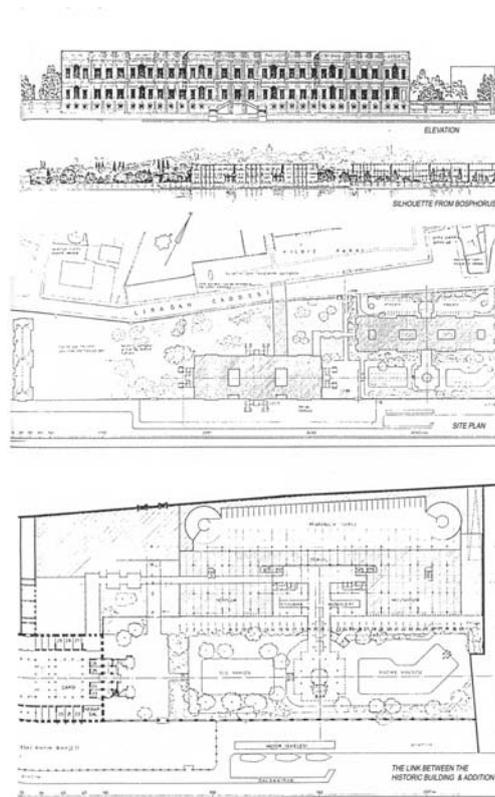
Çırağan Palace , Façade and Site Plan (Kıran 1993, p.117-118)
